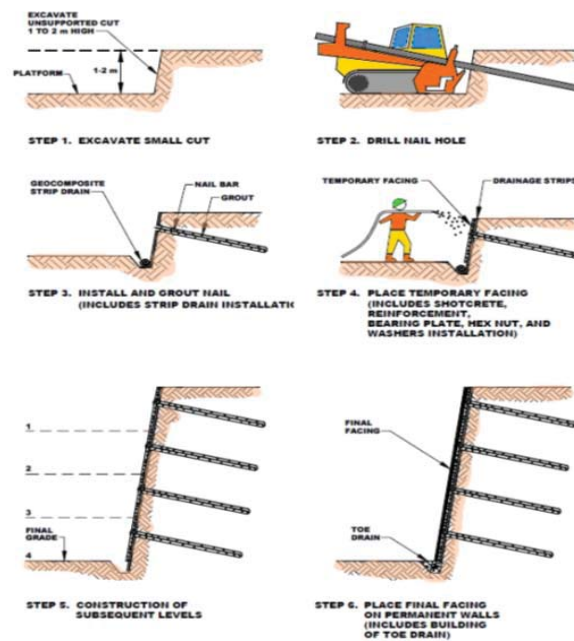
Soil nail wall sequence (after GEC#7, 2003)
